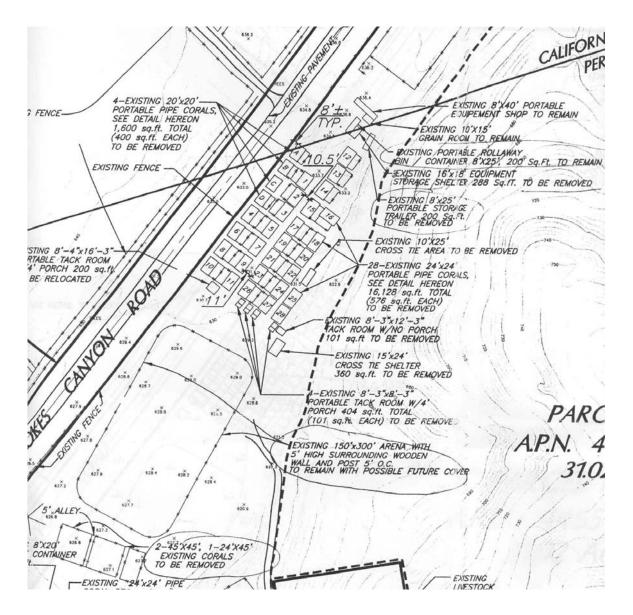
CDPA No. 4-02-131 Site Detail - North (Existing)
